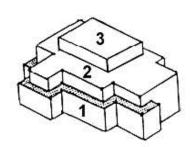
BUILDING OFFSETS AND ARTICULATION
